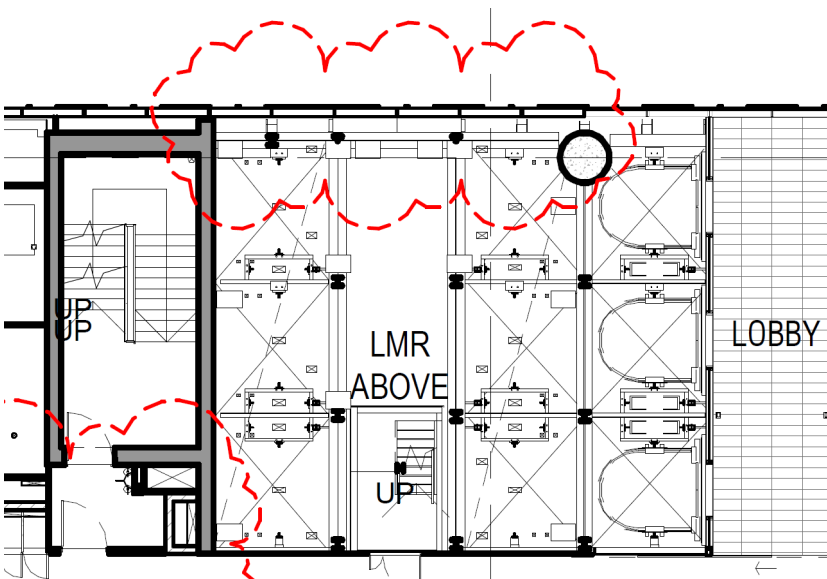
Level 15 Plan view extract showing lift motor room and fire separation slab extended (proposed)
